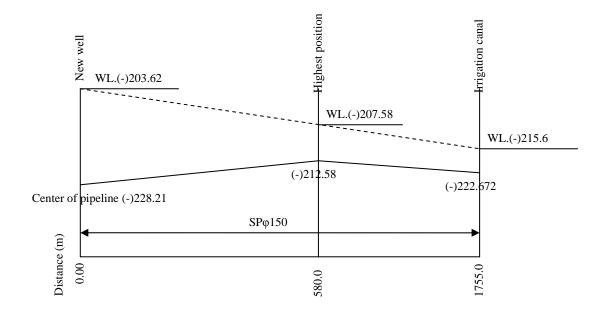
Hydraulic vertical plan of new well to irrigation canal
